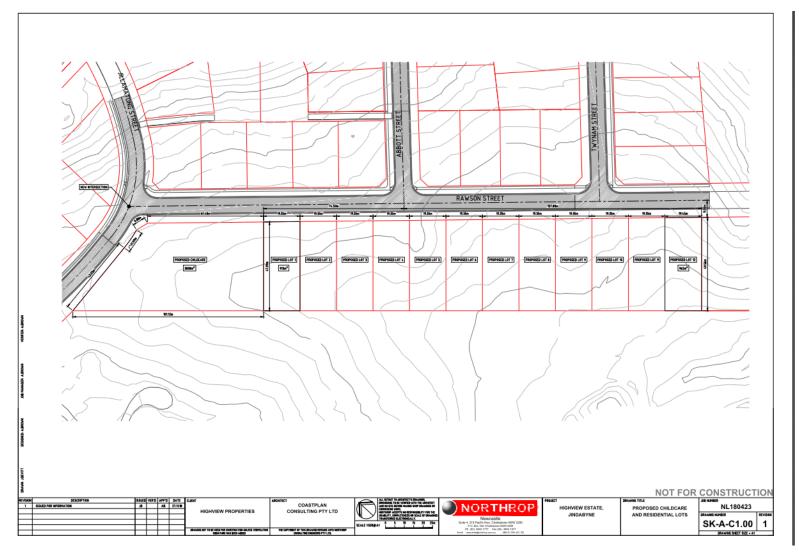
Potential Future Subdivision should the Planning Proposal be successful
